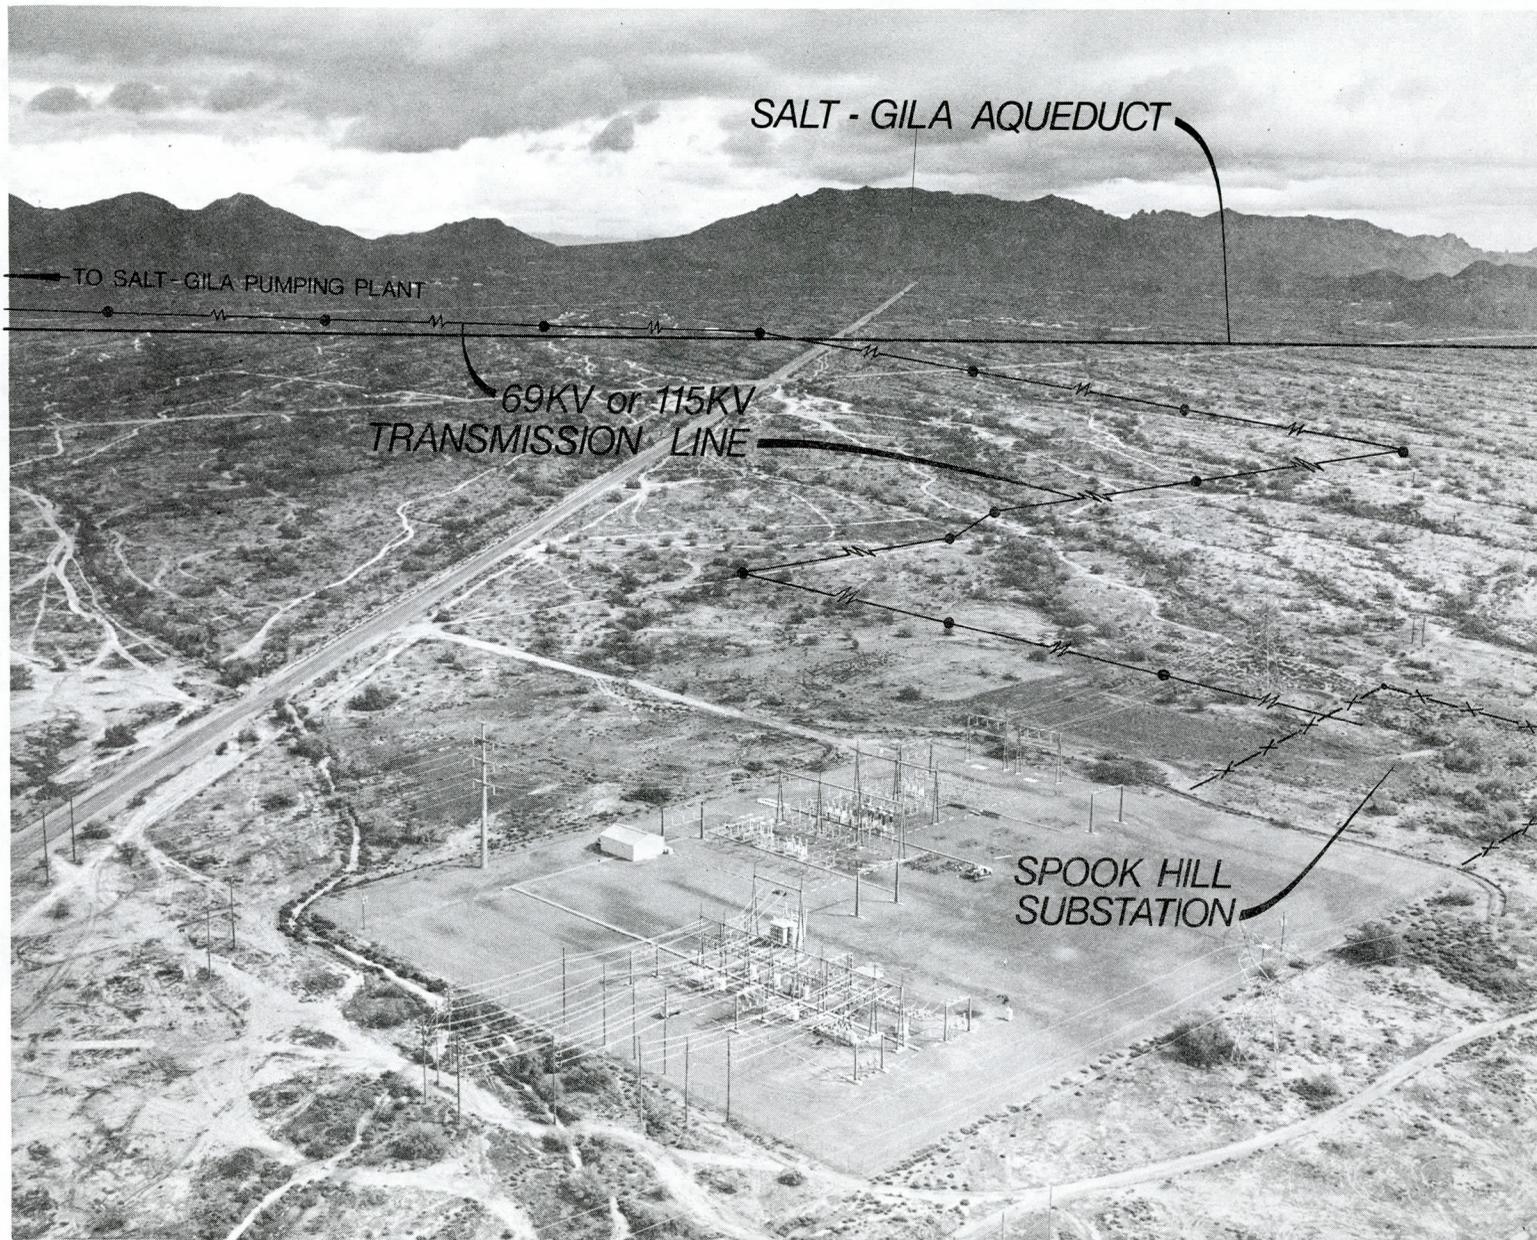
Thunderstone Substation--Salt River Project. Aerial view northeast showing the area where Spook Hill Substation would be constructed. Thunderstone Substation is located on Usury Pass Road northeast of Mesa, Arizona. Photograph No. P344-300-02497 NA (0).
